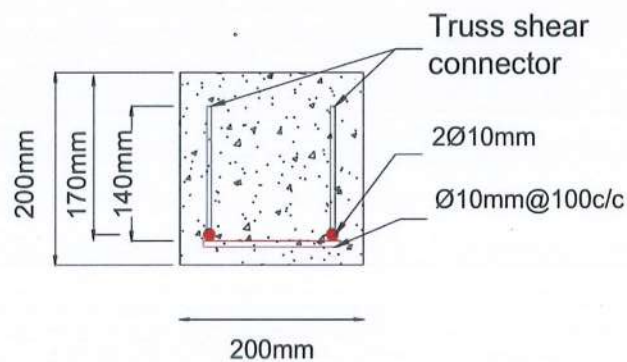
Cross-Section for Beams with Truss Shear Connectors.
